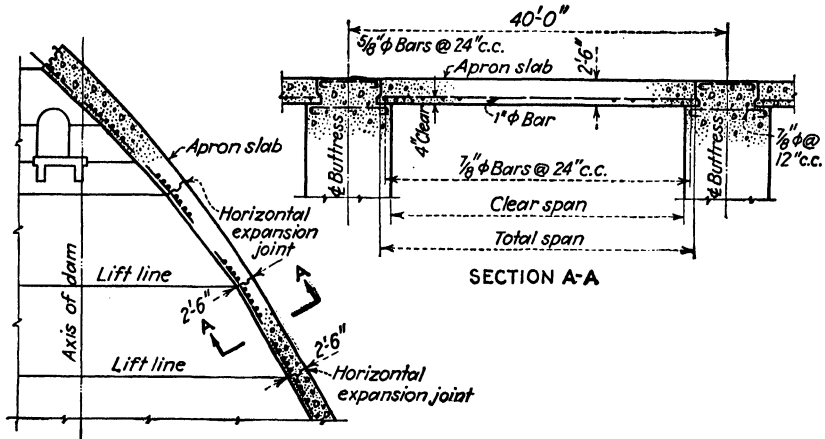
Possum Kingdom Dam. Typical apron slab.
